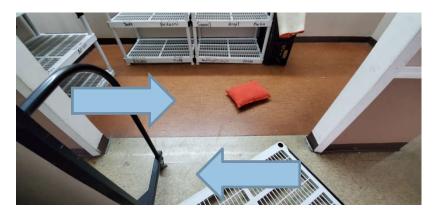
Subject Area – 7650 West 8th Avenue, Hialeah, Florida 33014.
